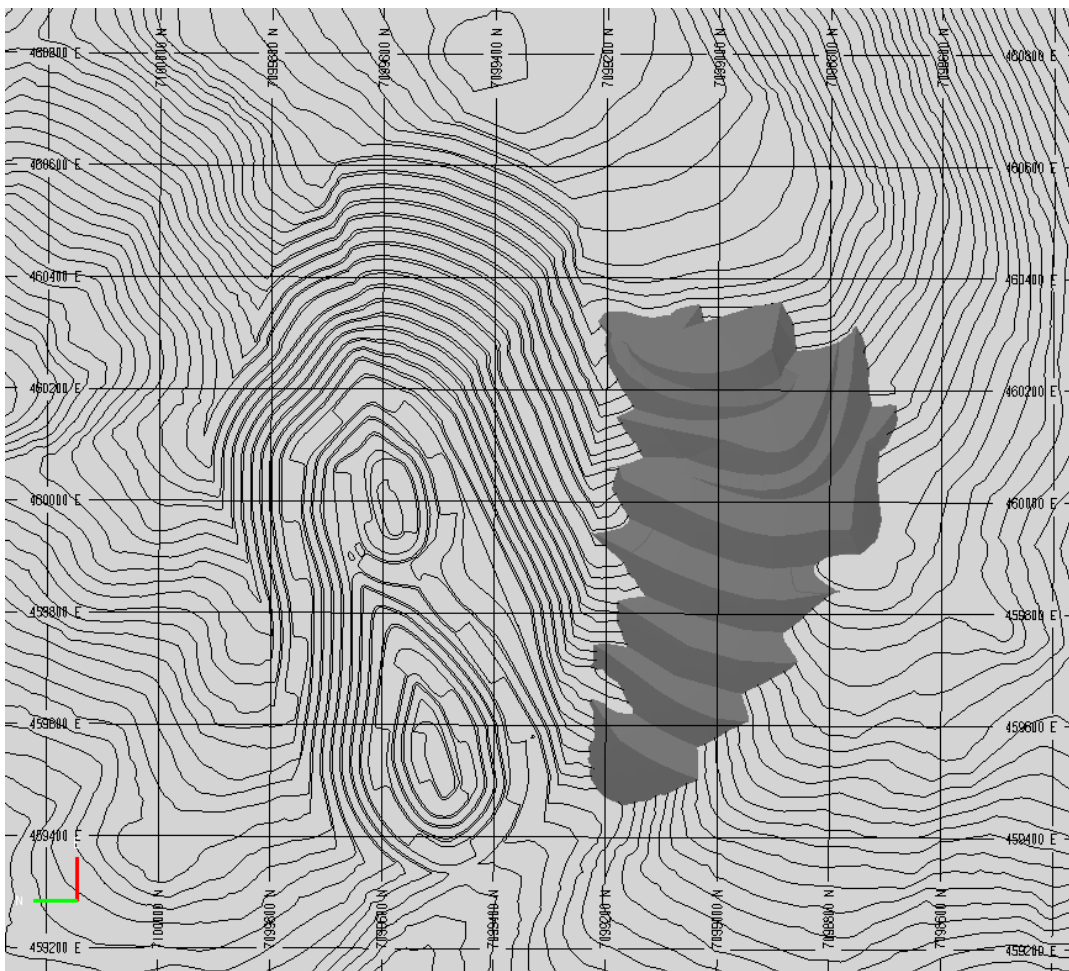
Plan View of the Platinum Gulch Waste Rock Storage Area at Full Build-Out
